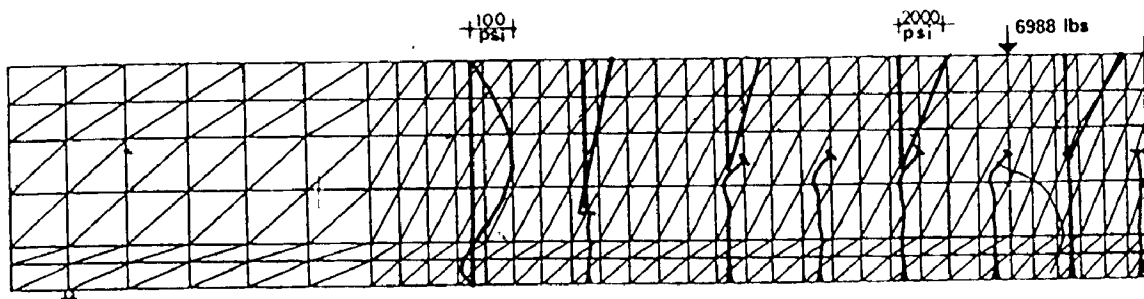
25 DETAILS OF CRACK PROPAGATION AND CONCRETE, STEEL AND BOND STRESS DISTRIBUTIONS FOR BEAM(7/1)
